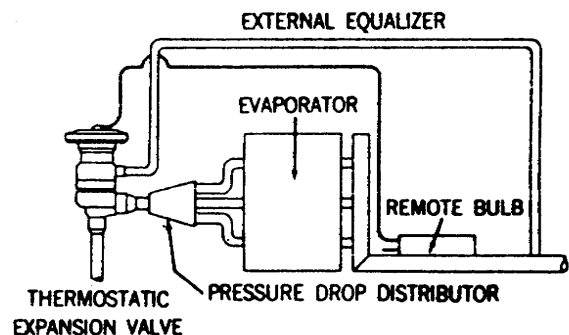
Single outlet expansion valve with a pressure drop distributor.
